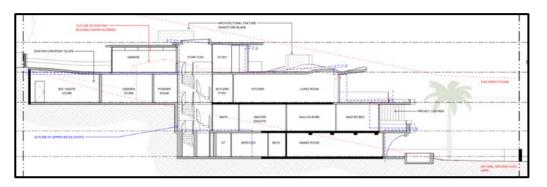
Section plan of the development showing the existing floors and walls in black and new floors and walls in grey
